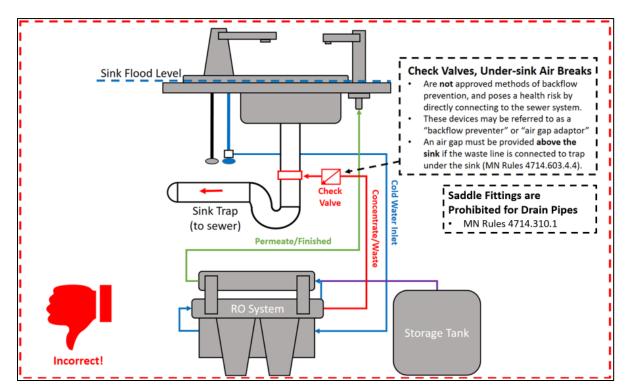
Incorrect Installation with Direct Connection to Sewer as described below.
